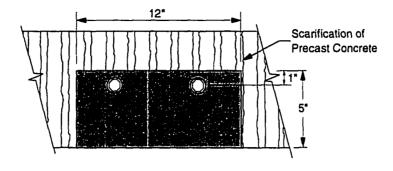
Reinforcement details in the CIP portion of the deck.
